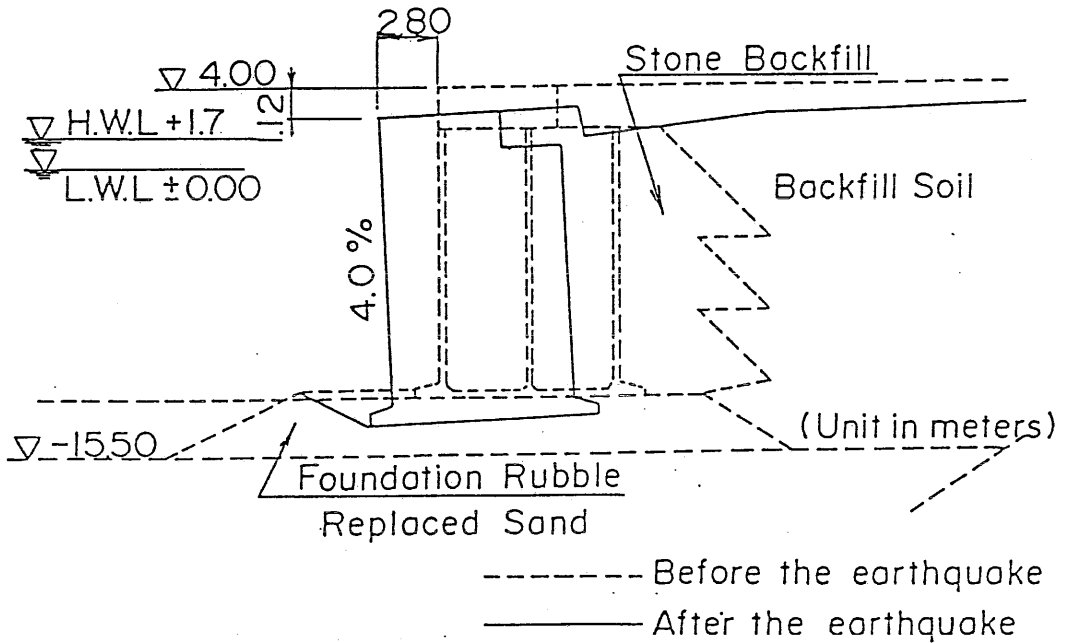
Typical Failure of Caisson at Kobe. (From Inagaki *et al*, 1996.)
